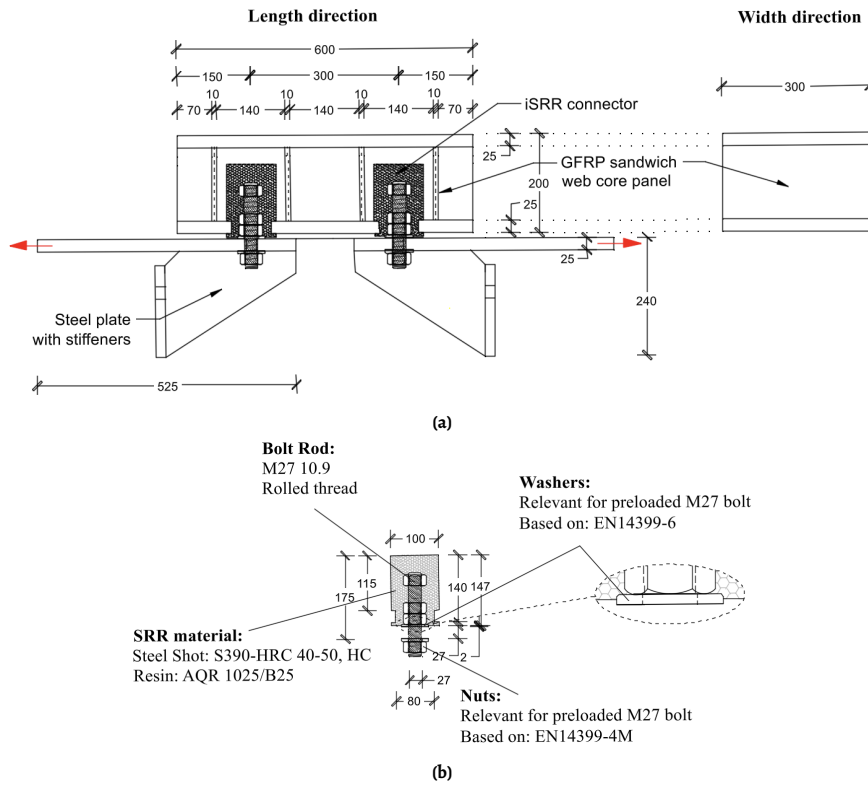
iSRR connectors in composite-steel single-lap shear joint specimens (dimensions in mm): (a) Detailed view of configuration (red arrows indicate loading direction), (b) Details of the connector.
